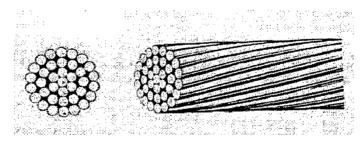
High-Strength Bridge Strand Steel Wire Cables
